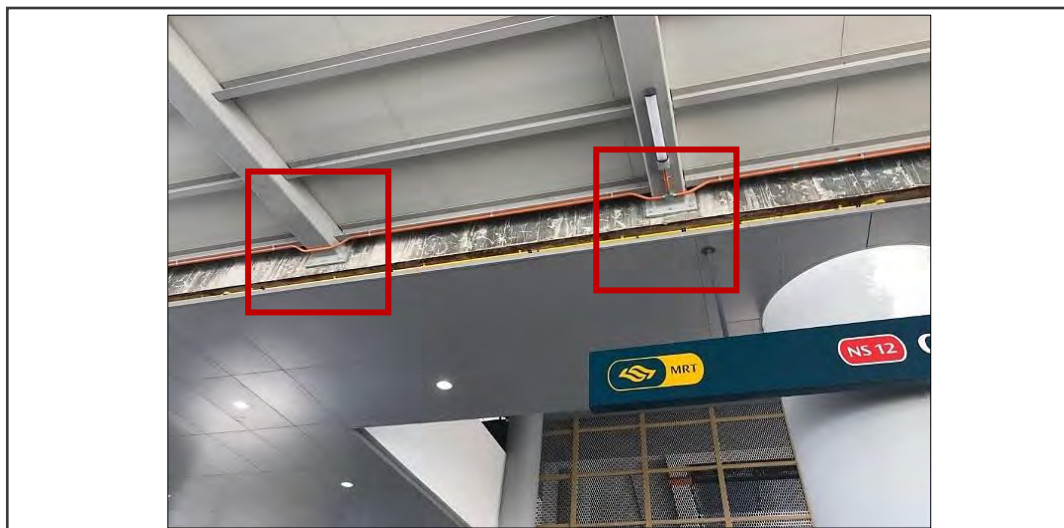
An Example of a Dependent Structure Connected to an Adjacent Structure, Beam Connections of a Shelter are Structurally Dependent on Adjacent Structure
